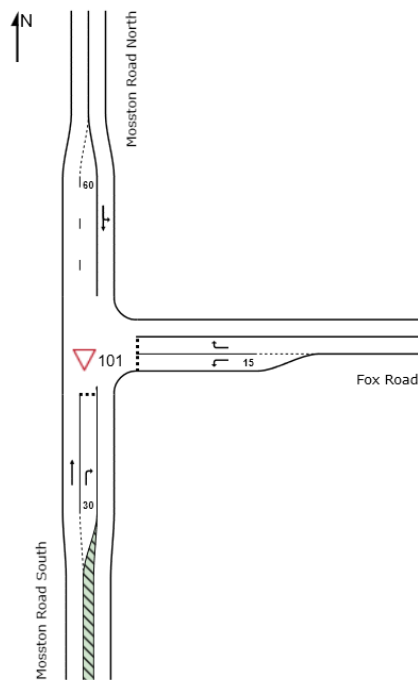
Modelled Layout of Mosston Road / Fox Road Intersection
